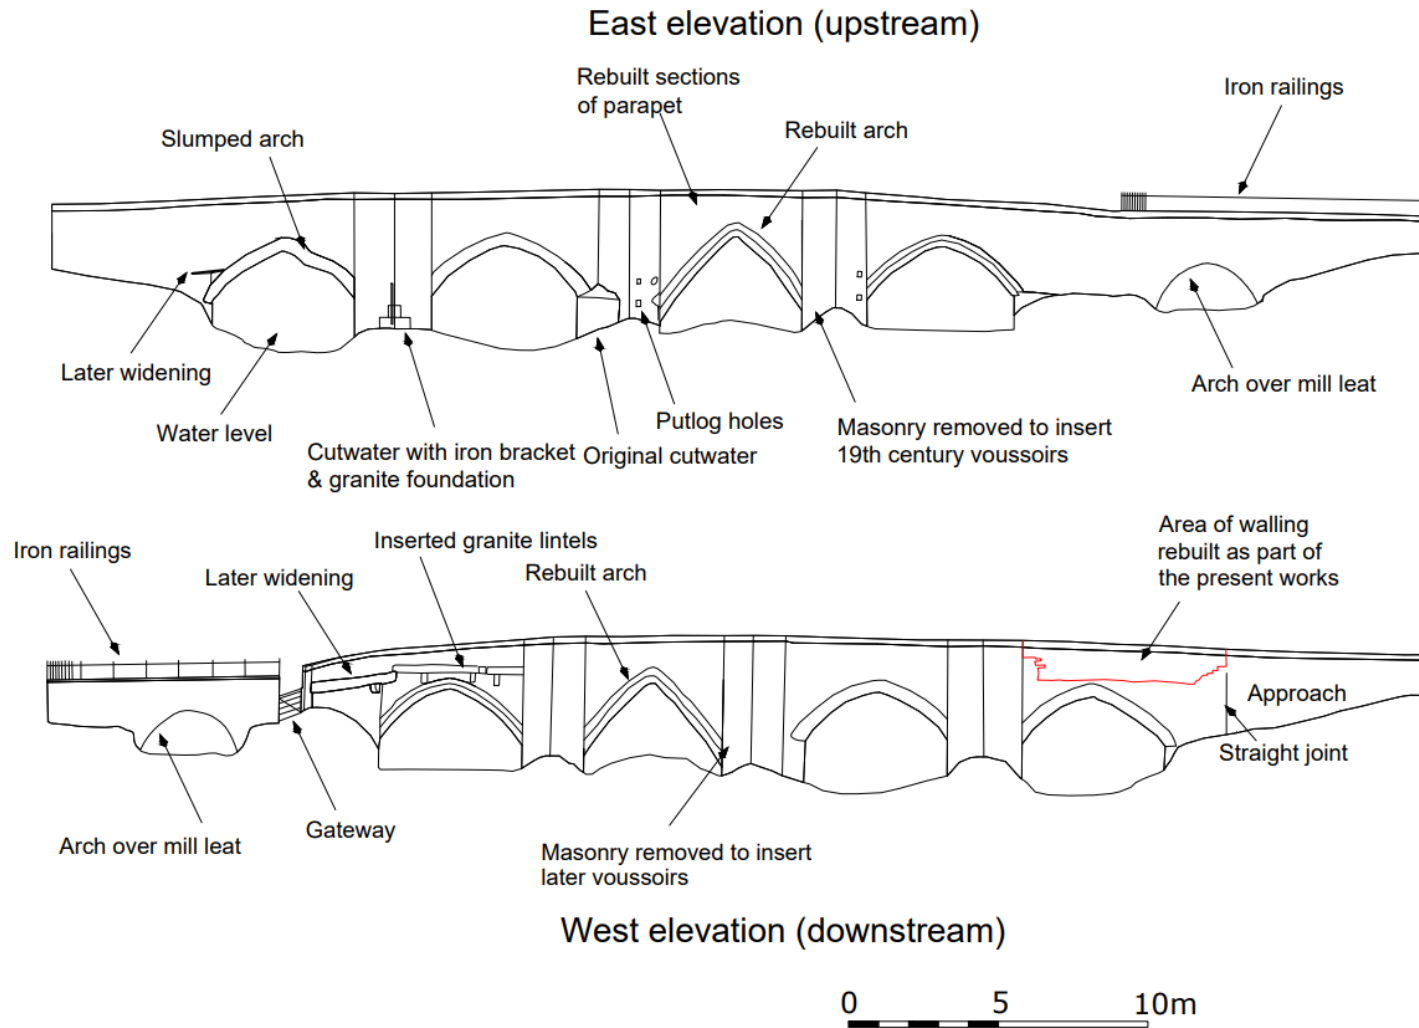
Elevation drawings of the bridge after Thomas, N, 2000 showing area of damaged walling.
